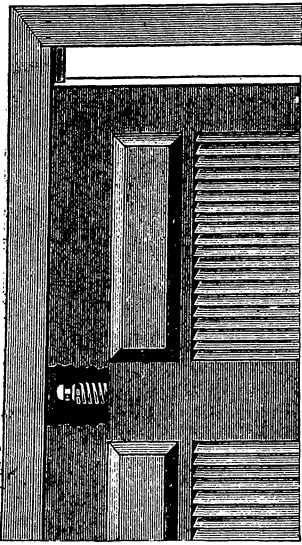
Sash Holder Applied to Sliding Blinds.
